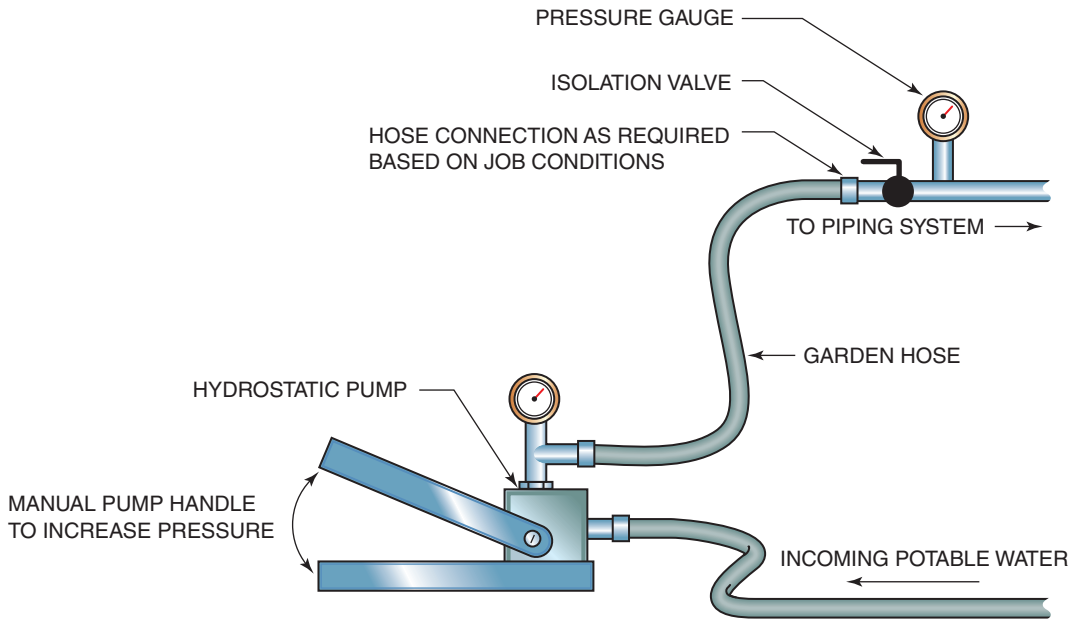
A hydrostatic water test is another method to test a water piping system.
